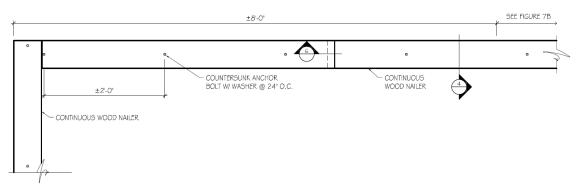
A - ROOF EDGE WOOD BLOCKING @ CORNER - THROUGH BOLT ANCHORAGE 8'-0" FROM CORNER
